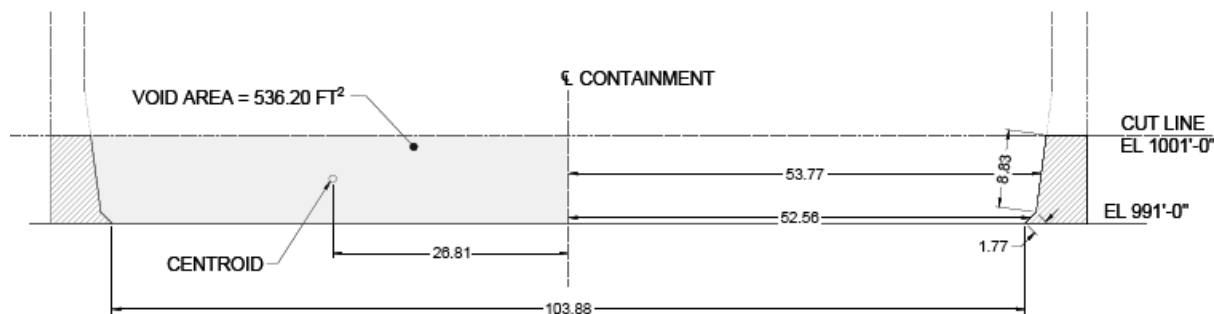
Void Area Inside Containment & Sloped Wall Surface Area
